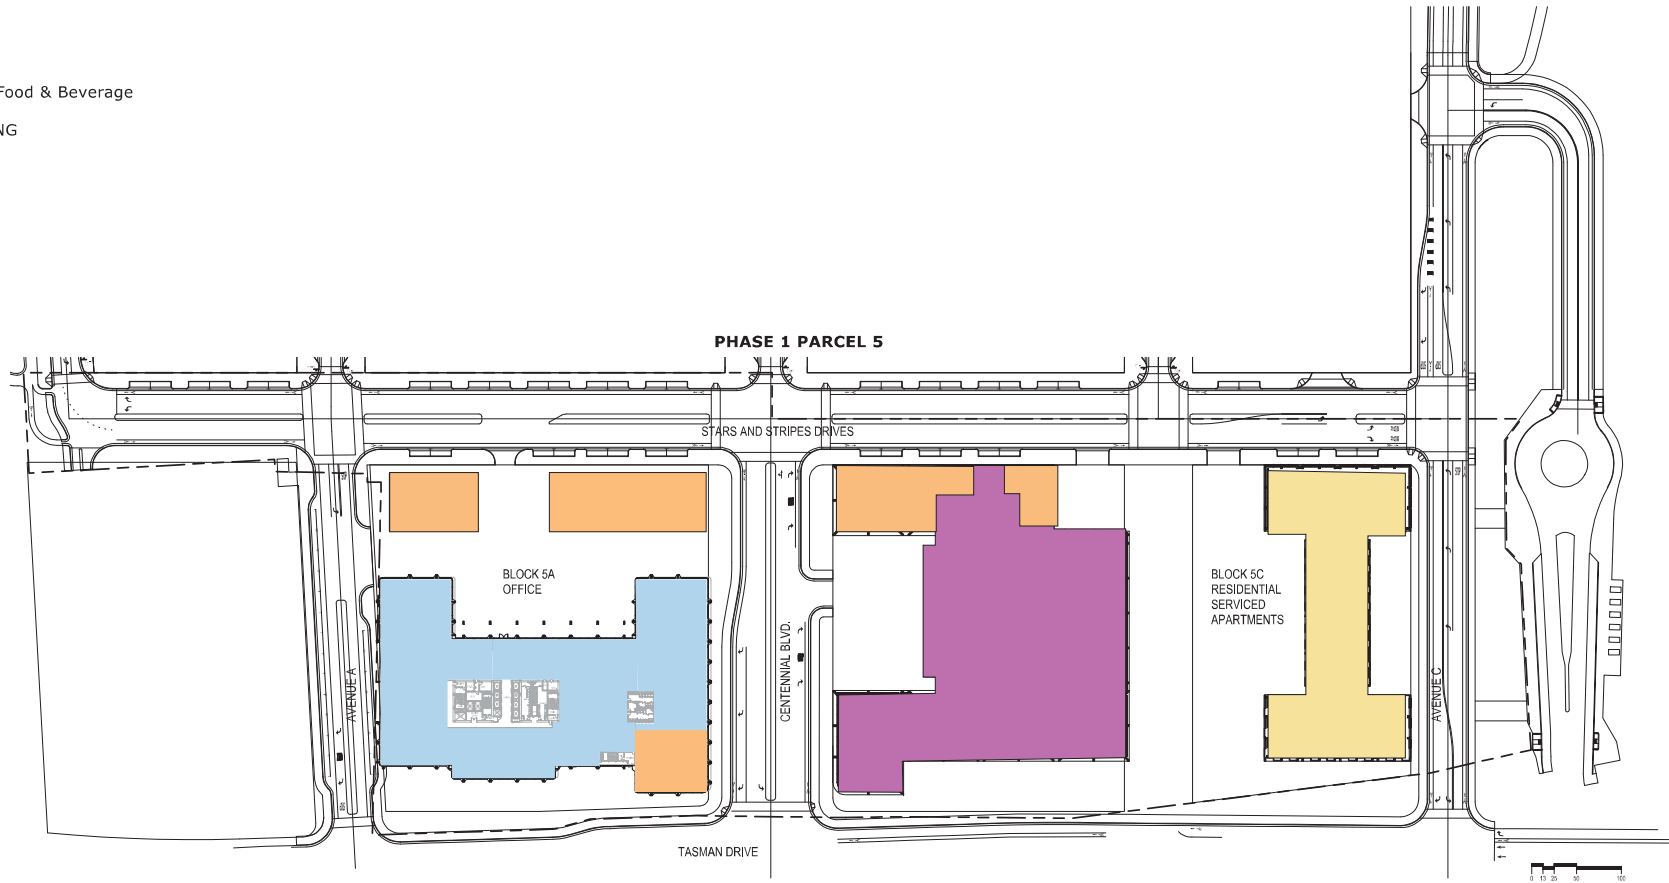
SITE PLAN. LOCATION OF POTENTIAL USES
